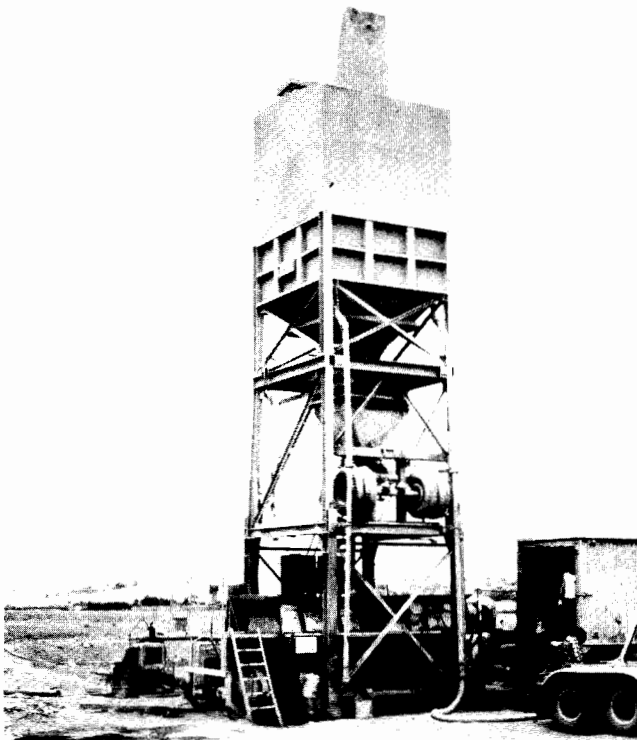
Paddle mixing plant. Cement scale, surge hopper, and storage silo located above two 6-cu-yd capacity mixing chambers.
